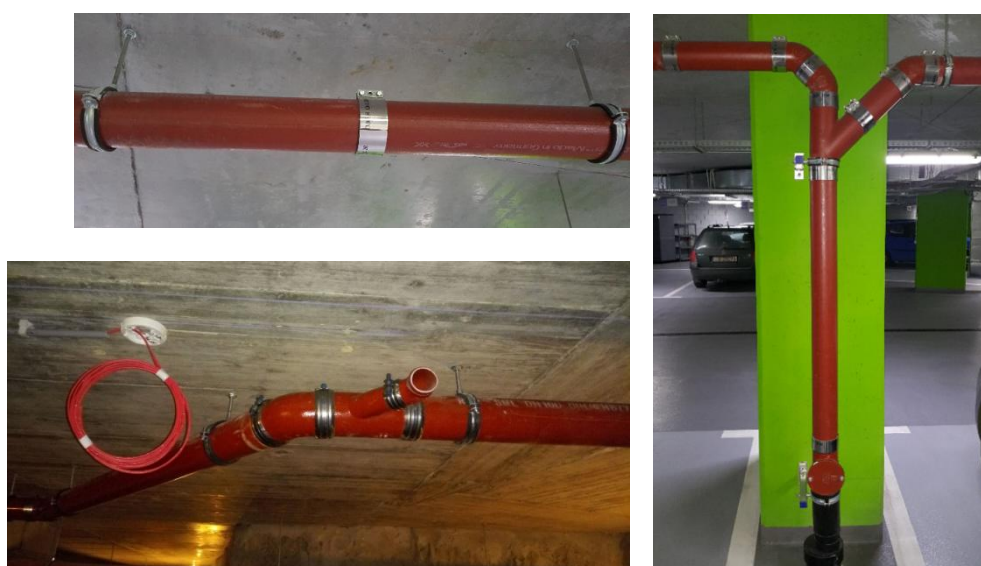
A part of an installation made of SML pipes, using CV type clamps. (own source)
